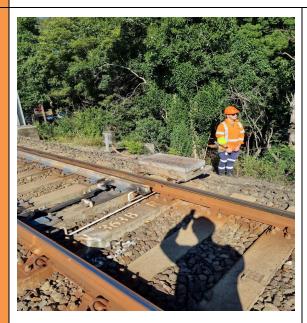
Lookout position on the Down Bankstown line at 19.157 KM watching for rail traffic on Up Bankstown, for work on 363 points.
